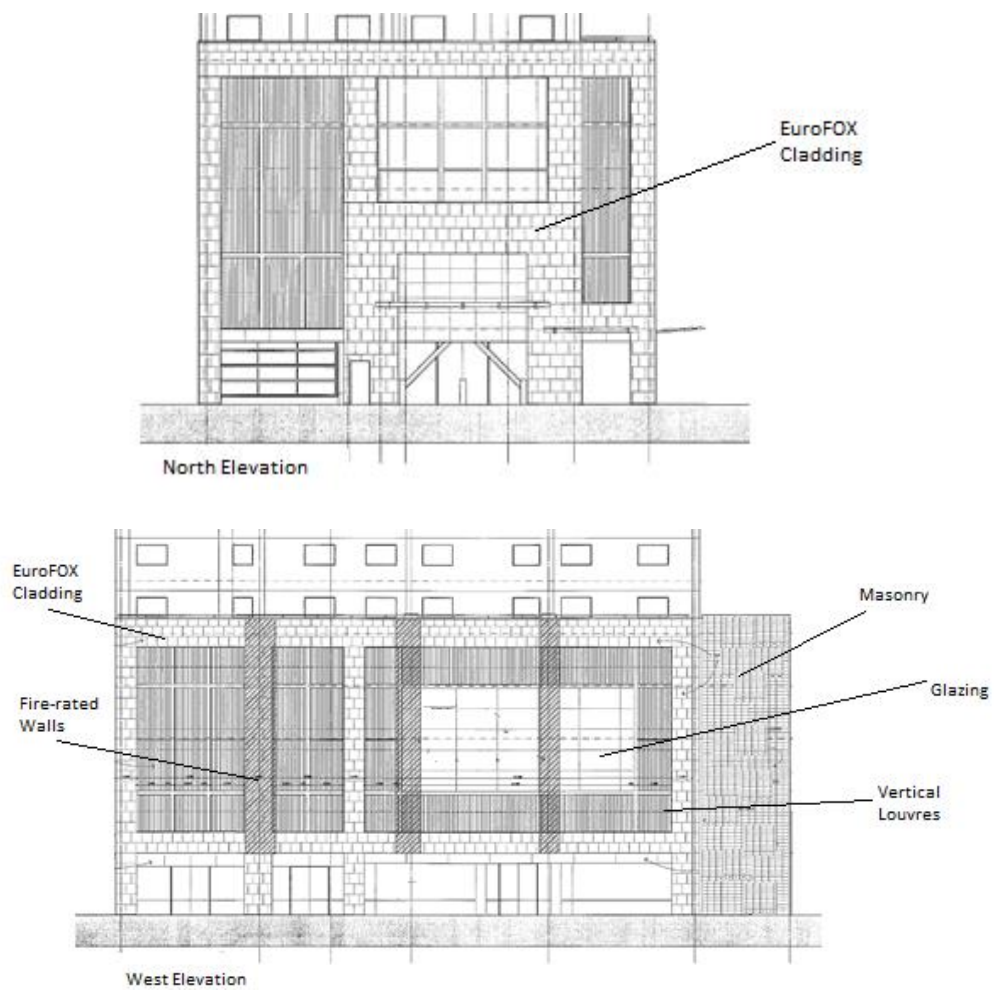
North and West Elevation of the Pacific Tower (Christchurch City Council 2016a)
